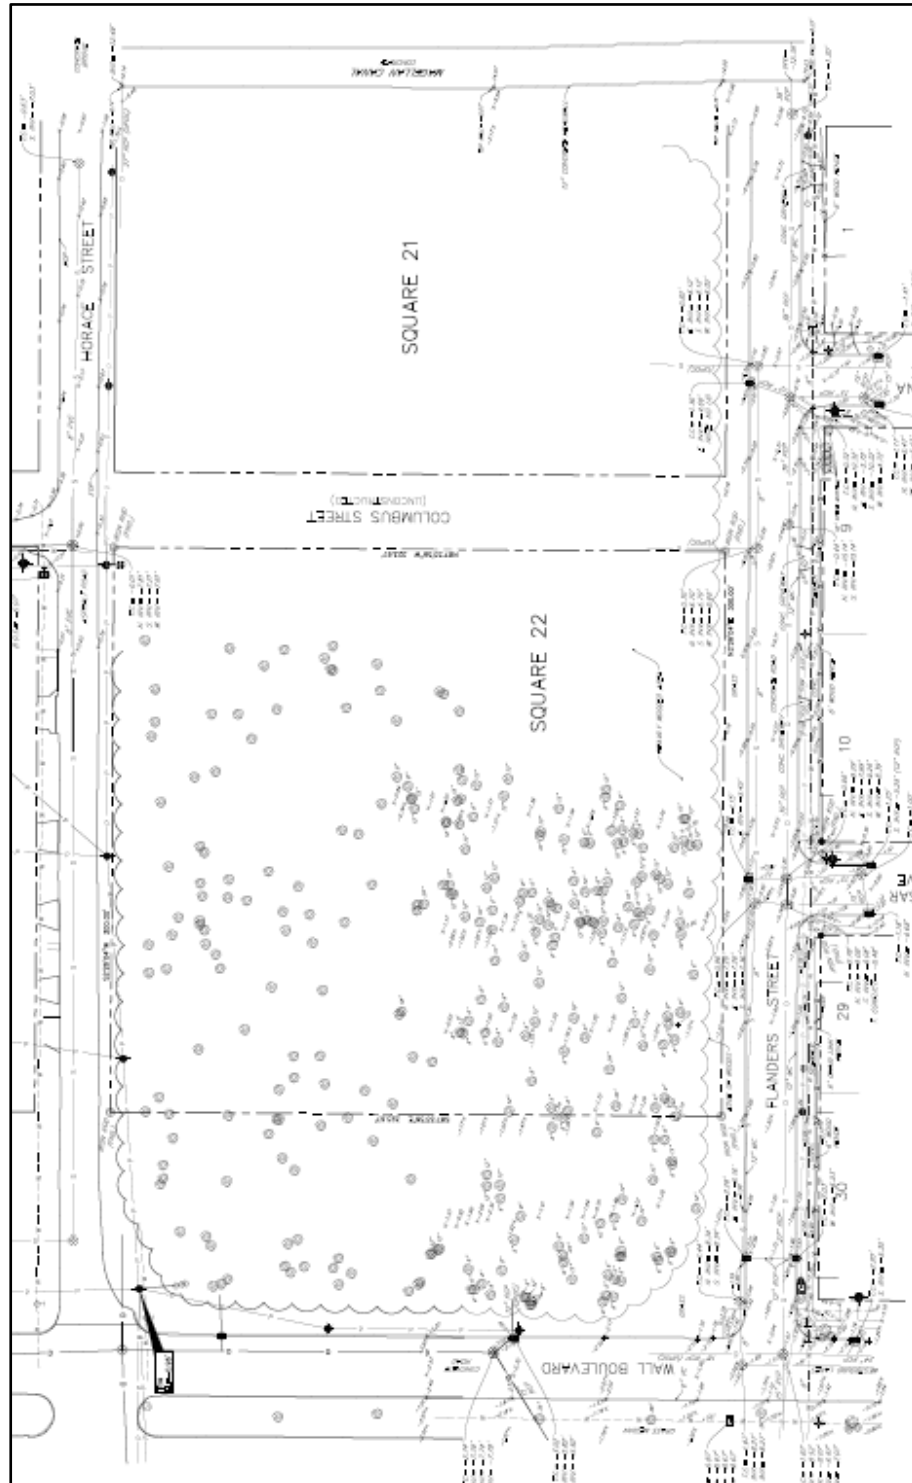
Pre-construction site plan showing the proposed Columbus Street extension. (Image Source: City of New Orleans NOPD 4th District Station, 95% Design Development Submittal, Holly & Smith Architects.)
